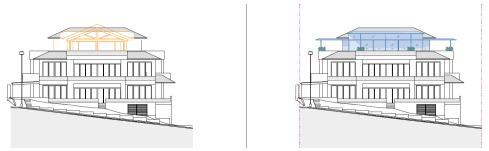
Existing and proposed elevation to Terrigal Esplanade (Klaus Carson Studio)
